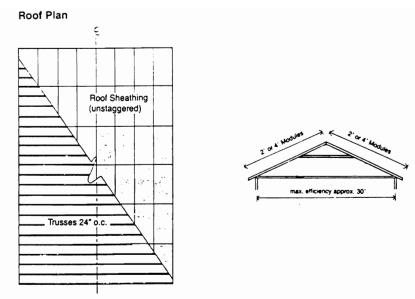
Roof Plan on Modular Layout (U.S. Department of Housing and Urban Development, 1981)
